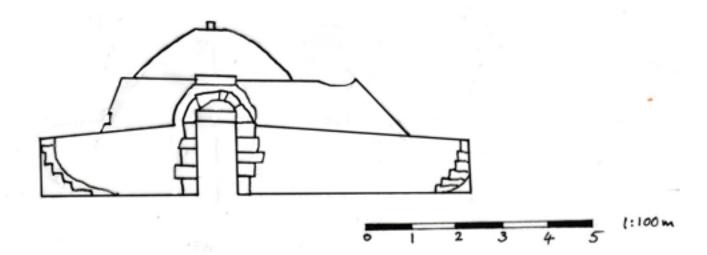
Sketch north elevation of the smaller trullo, showing domed roof and steps on the east and west sides. (D. Thynne)
